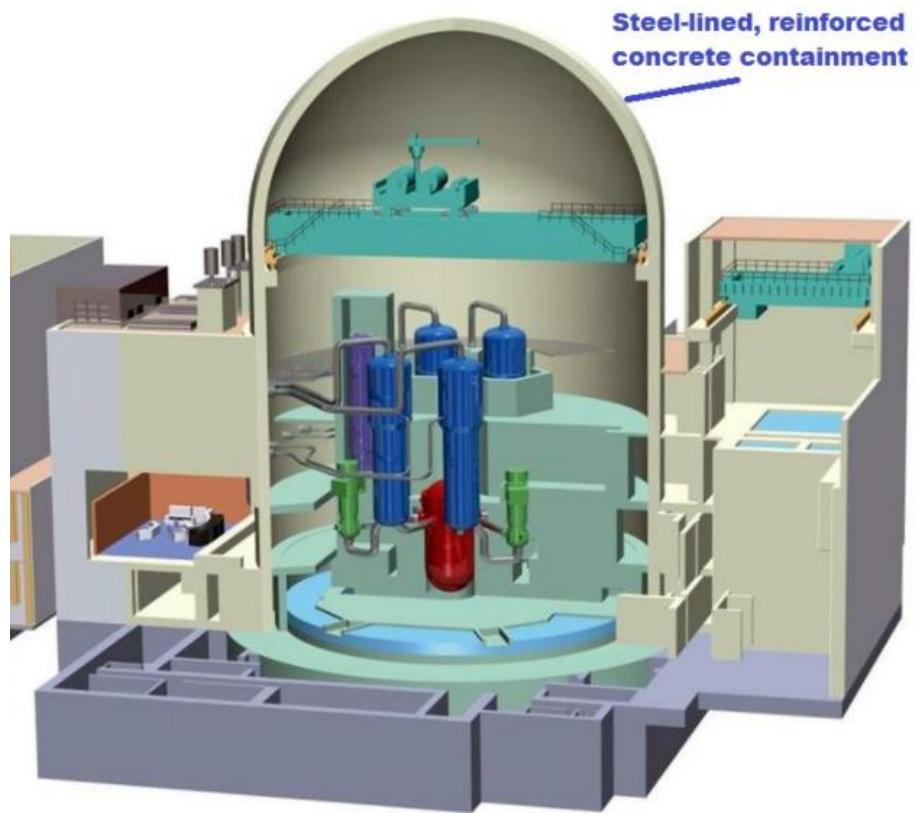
Nuclear power plant and its concrete containment structure (adapted from U.S. NRC Datasets, 2019).
